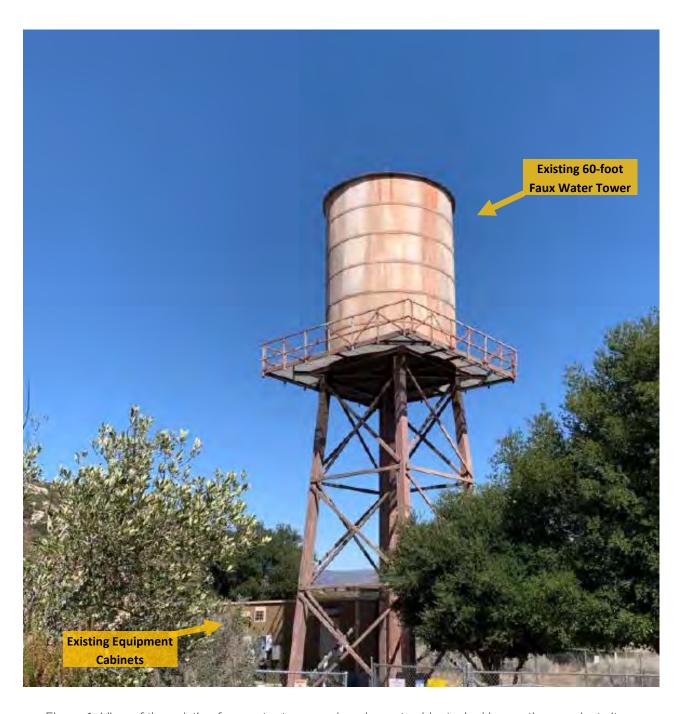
View of the existing faux water tower and equipment cabinets, looking north on project site.
